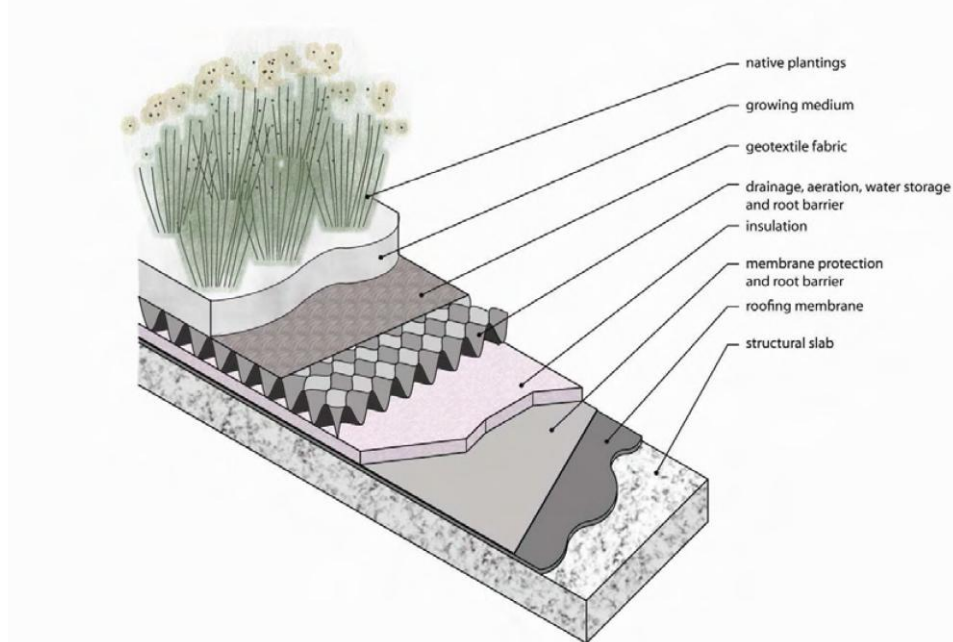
Typical Green Roof Cross-section (Source: City of Chicago, 2014).
